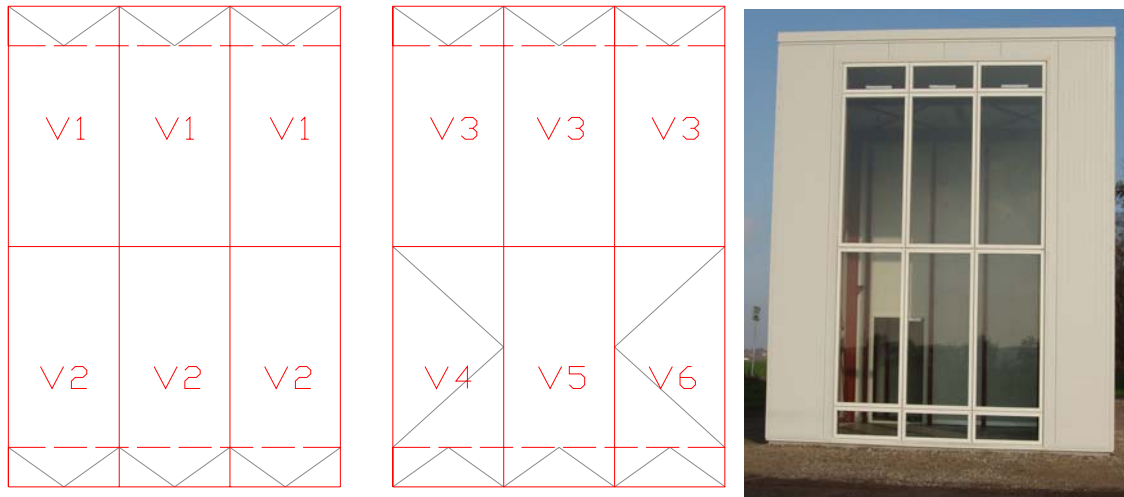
External window sections (left), Internal window section (center), photo of the DSF from the outside (right).
